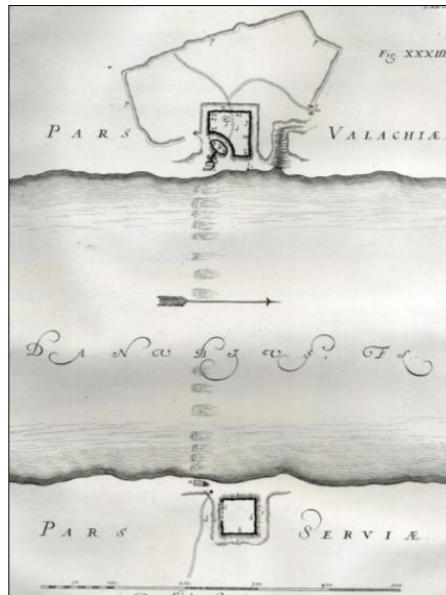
Plan of the two camps from Drobeta and Pontes and the alignment of the bridge built by Apolodor of Damascus (apud Marigli 1726, vol II, tab. 10).
